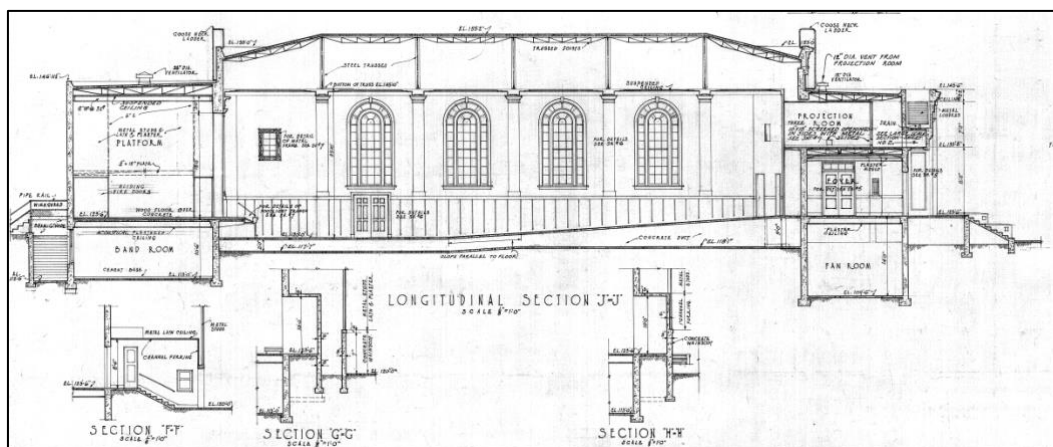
1936 Longitudinal Section, Assembly Building. Source: LAUSD Vault Drawings.
